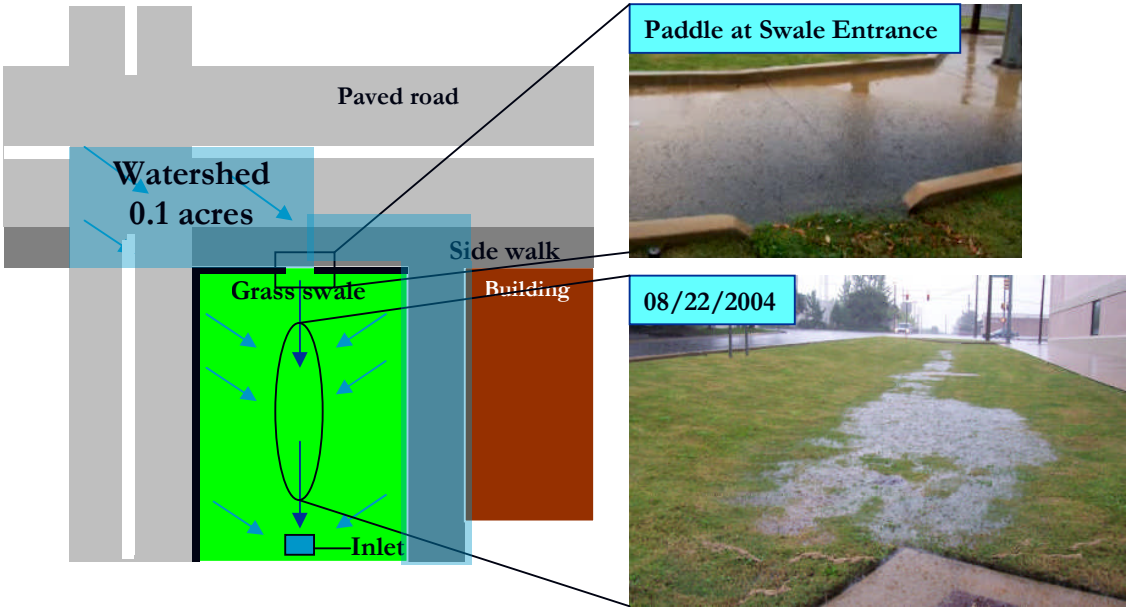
Outdoor grass swale monitoring site and surrounding land uses (Pictures of the entrance and overview of the swale during 08/22/2004 storm event).
